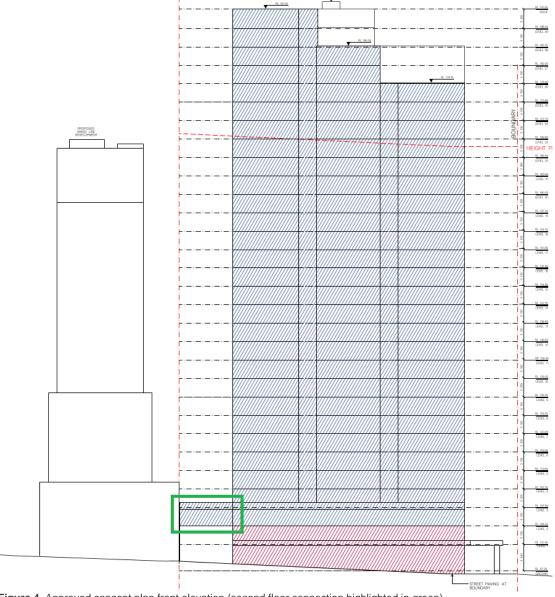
Approved concept plan front elevation (second floor connection highlighted in green).
